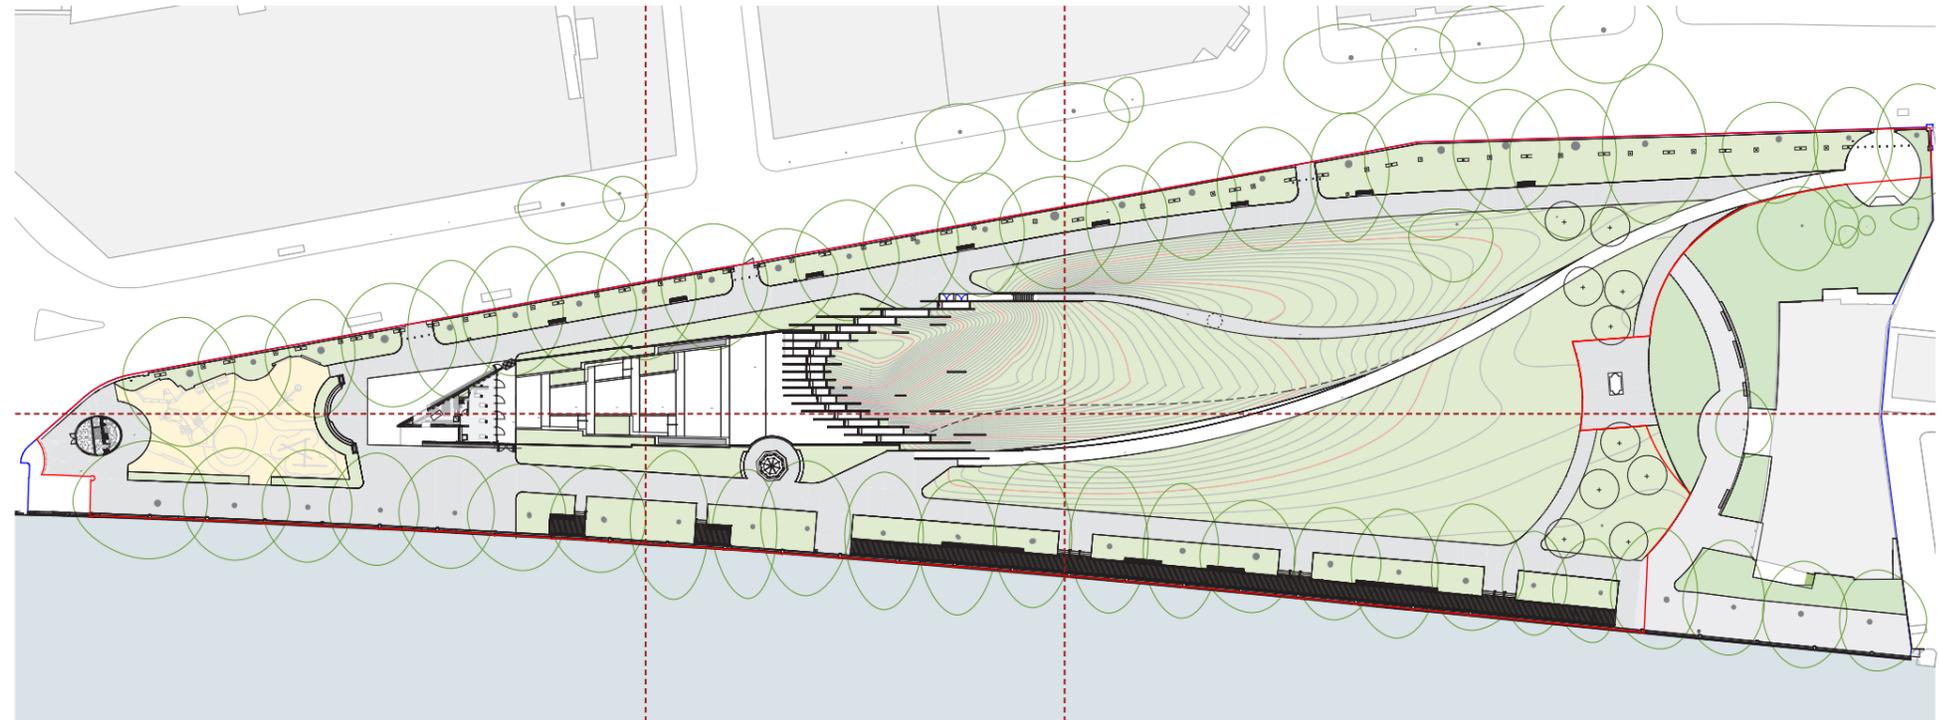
VICTORIA TOWER GARDENS -PROPOSED TOPOGRAPHICAL PLAN
